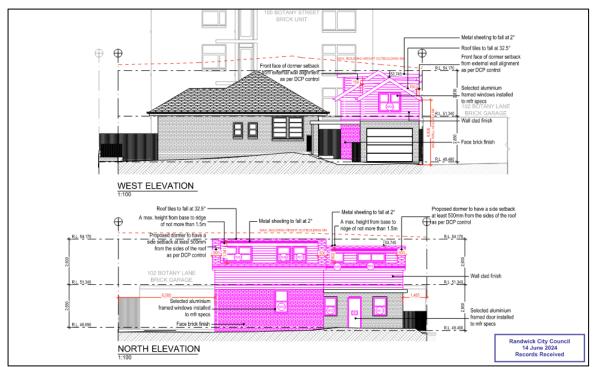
North and West elevations of pre-lodgement submission (Source: Gardner Design and Drafting).
